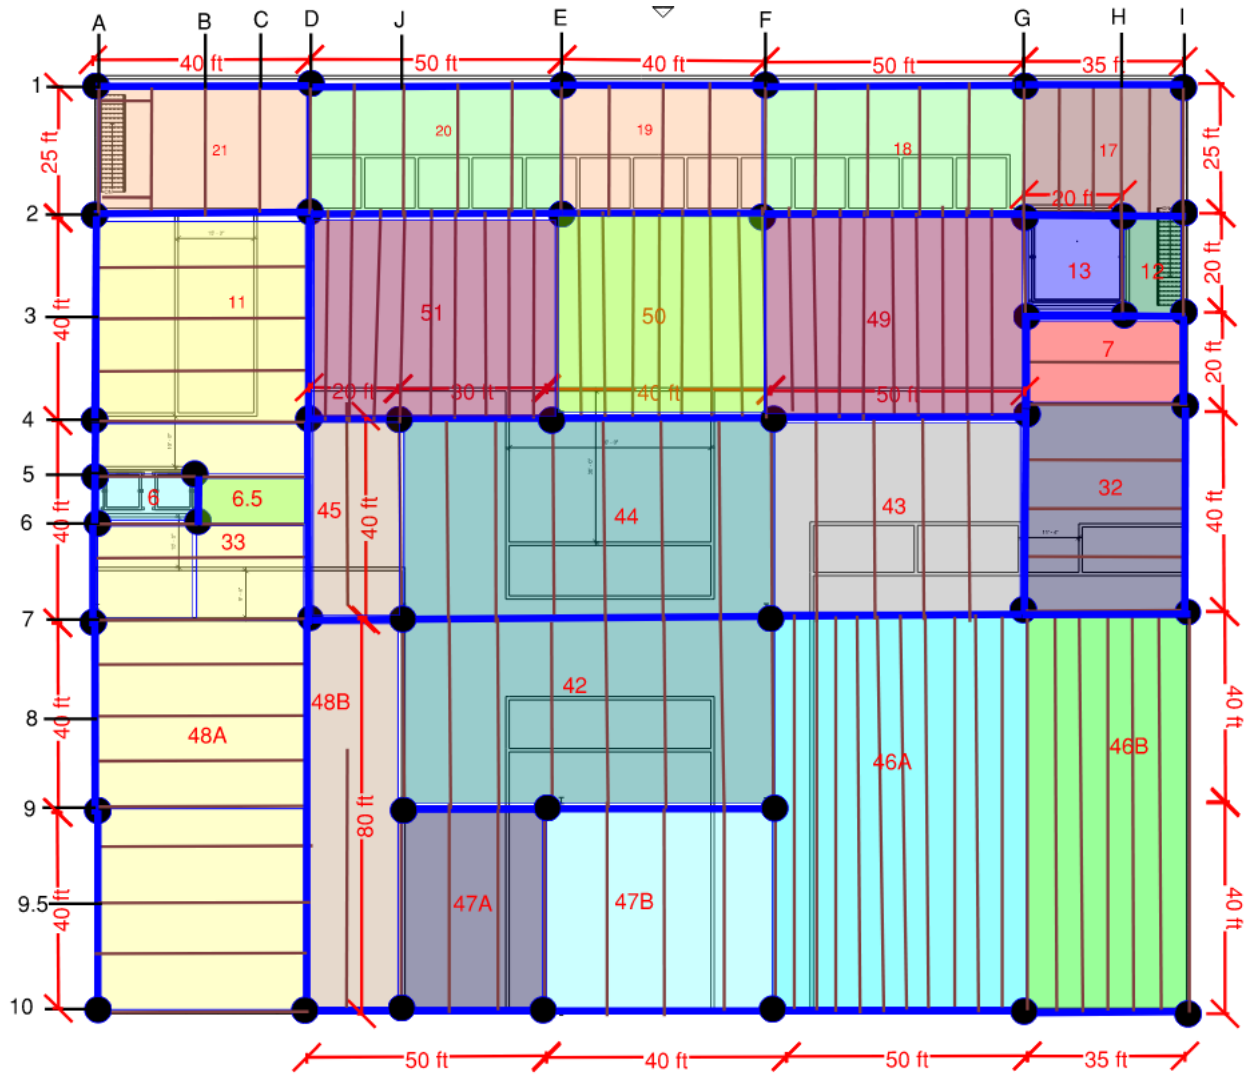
Bluebeam Markup of Beams, Girders, and Columns for the 4th Floor Plan.
